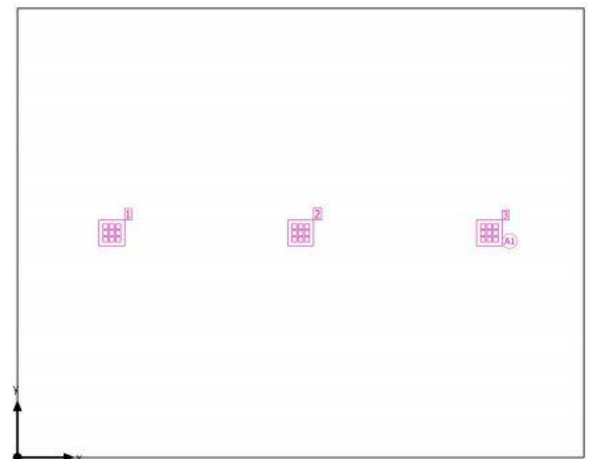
the light spacing and plan layout of the luminaires in the medium office from Lumen calculation
